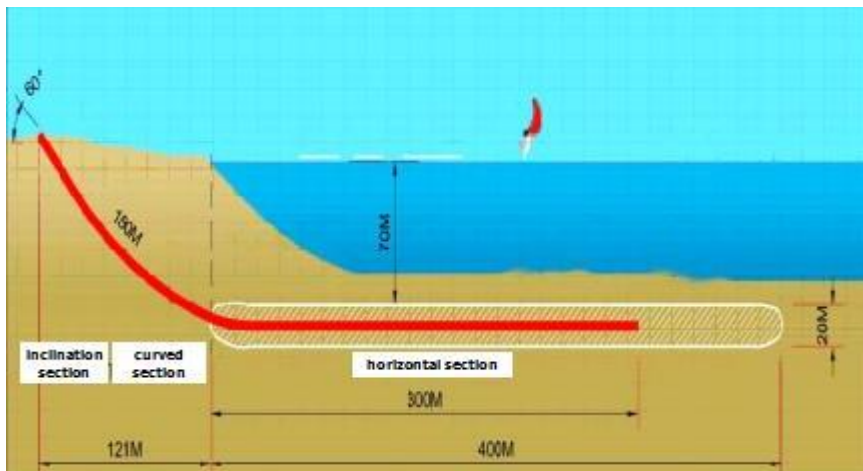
Horizontal directional coring used for the Jurong rock cavern at Jurong Island. The HDC trajectory is usually divided into three sections: 1) initial inclined straight section, 2) curve section, and 3) horizontal section (along tunnel alignment).
